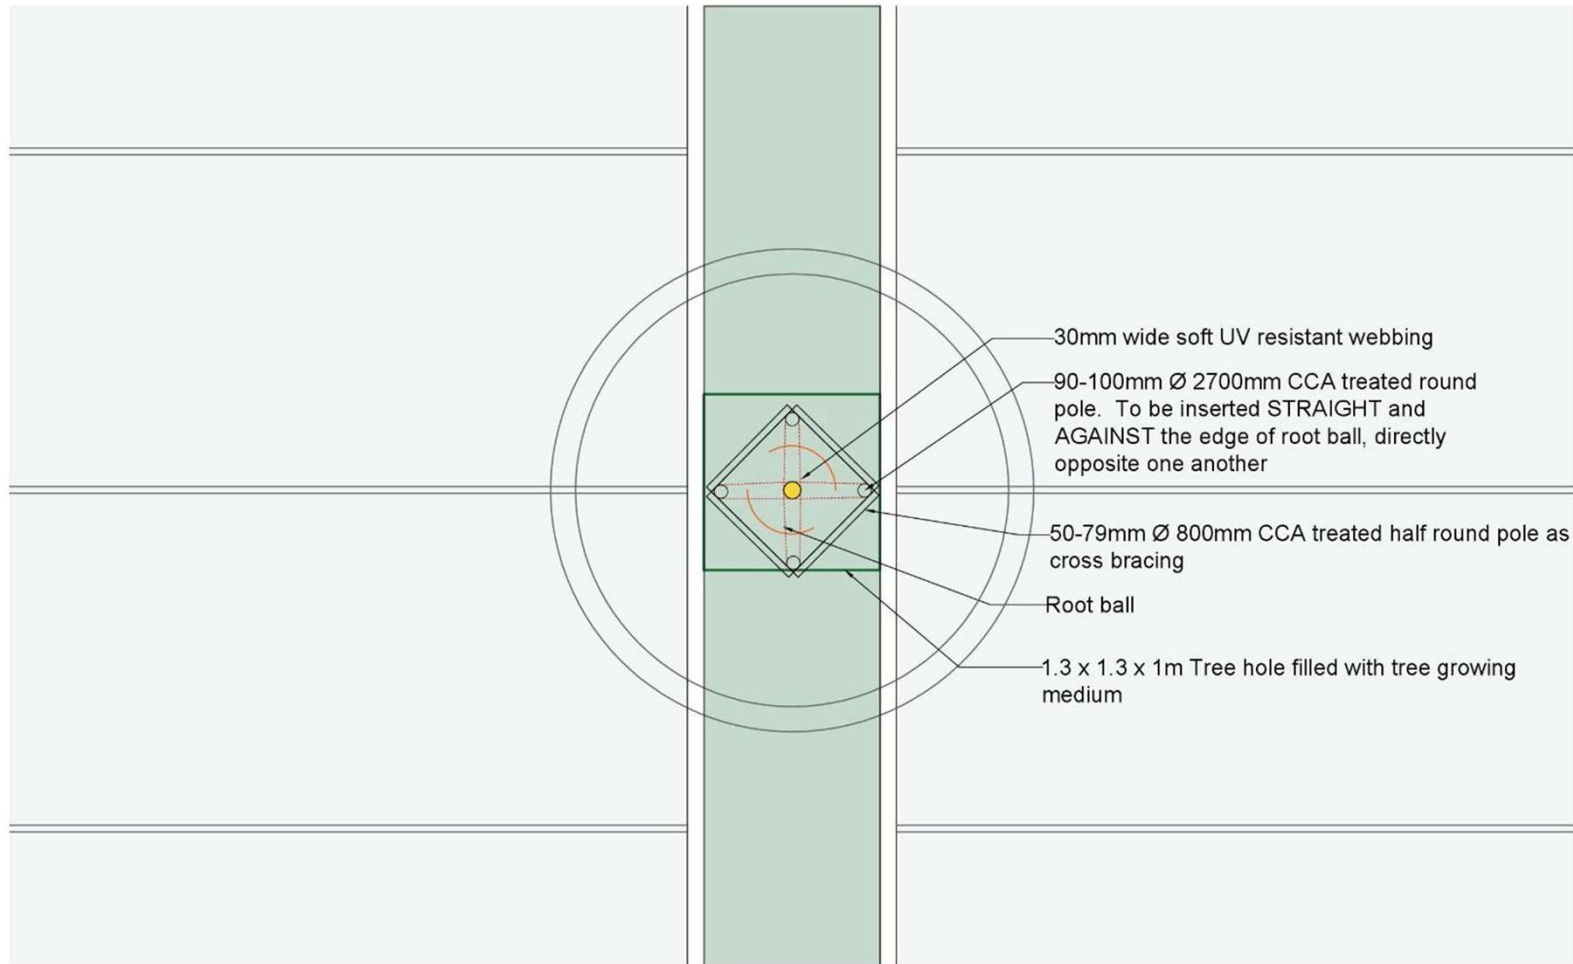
Parking Area Tree Detail Plan (Viridian Consulting, 2024)
